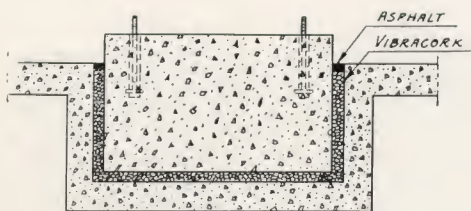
TYPICAL DEPRESSED FOUNDATION
